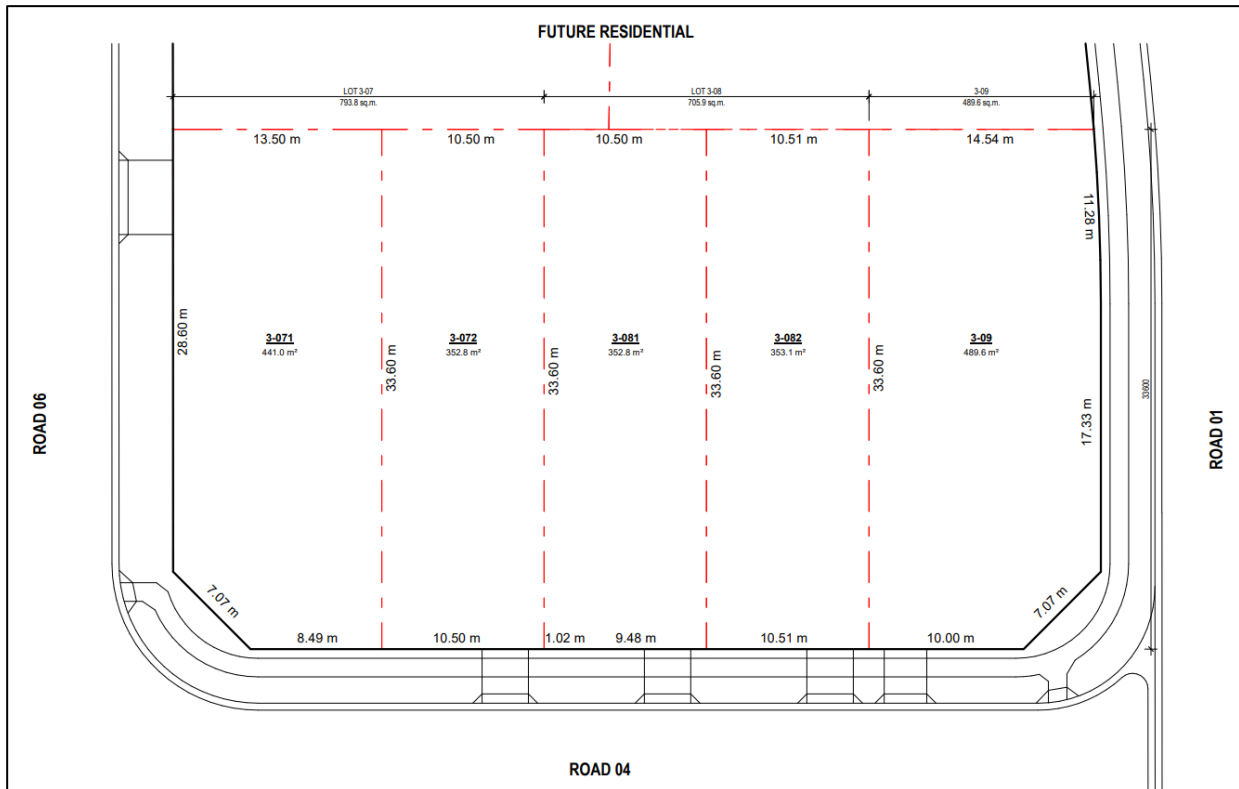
PROPOSED SUBDIVISION PLAN (PROPOSED LOTS 3-09, 3-071, 3-072, 3-081, 3-082)
